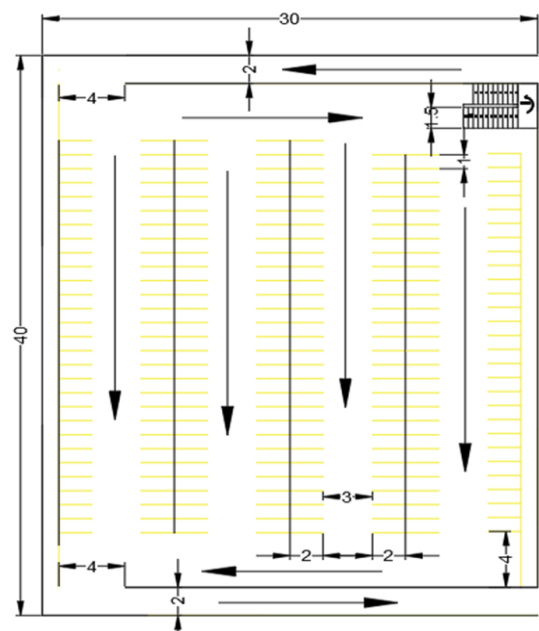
Planning of multistory parking in AUTOCAD (First Floor).
